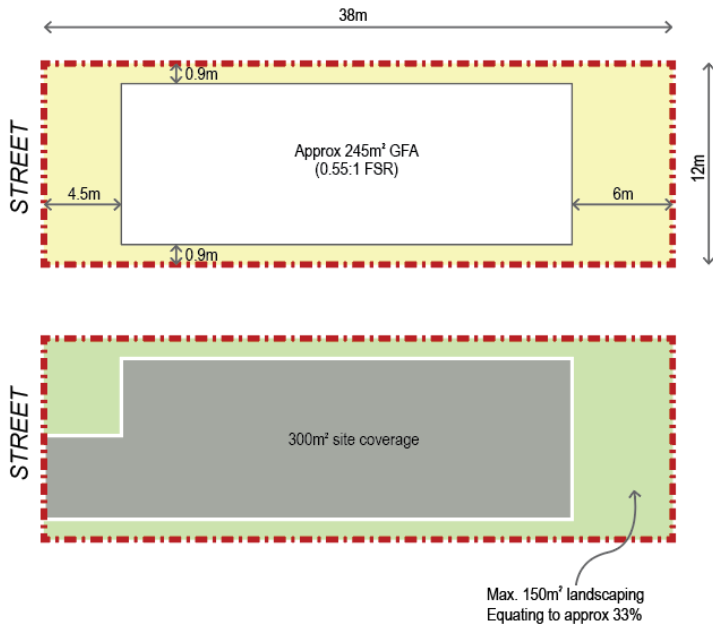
Plan of single storey dwelling house on a 450sqm site (non-FSPA)
